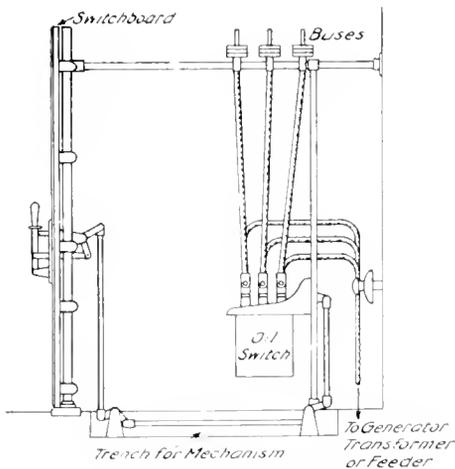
A Common Arrangement of Oil-Switch on Frame-work back of Switchboard
